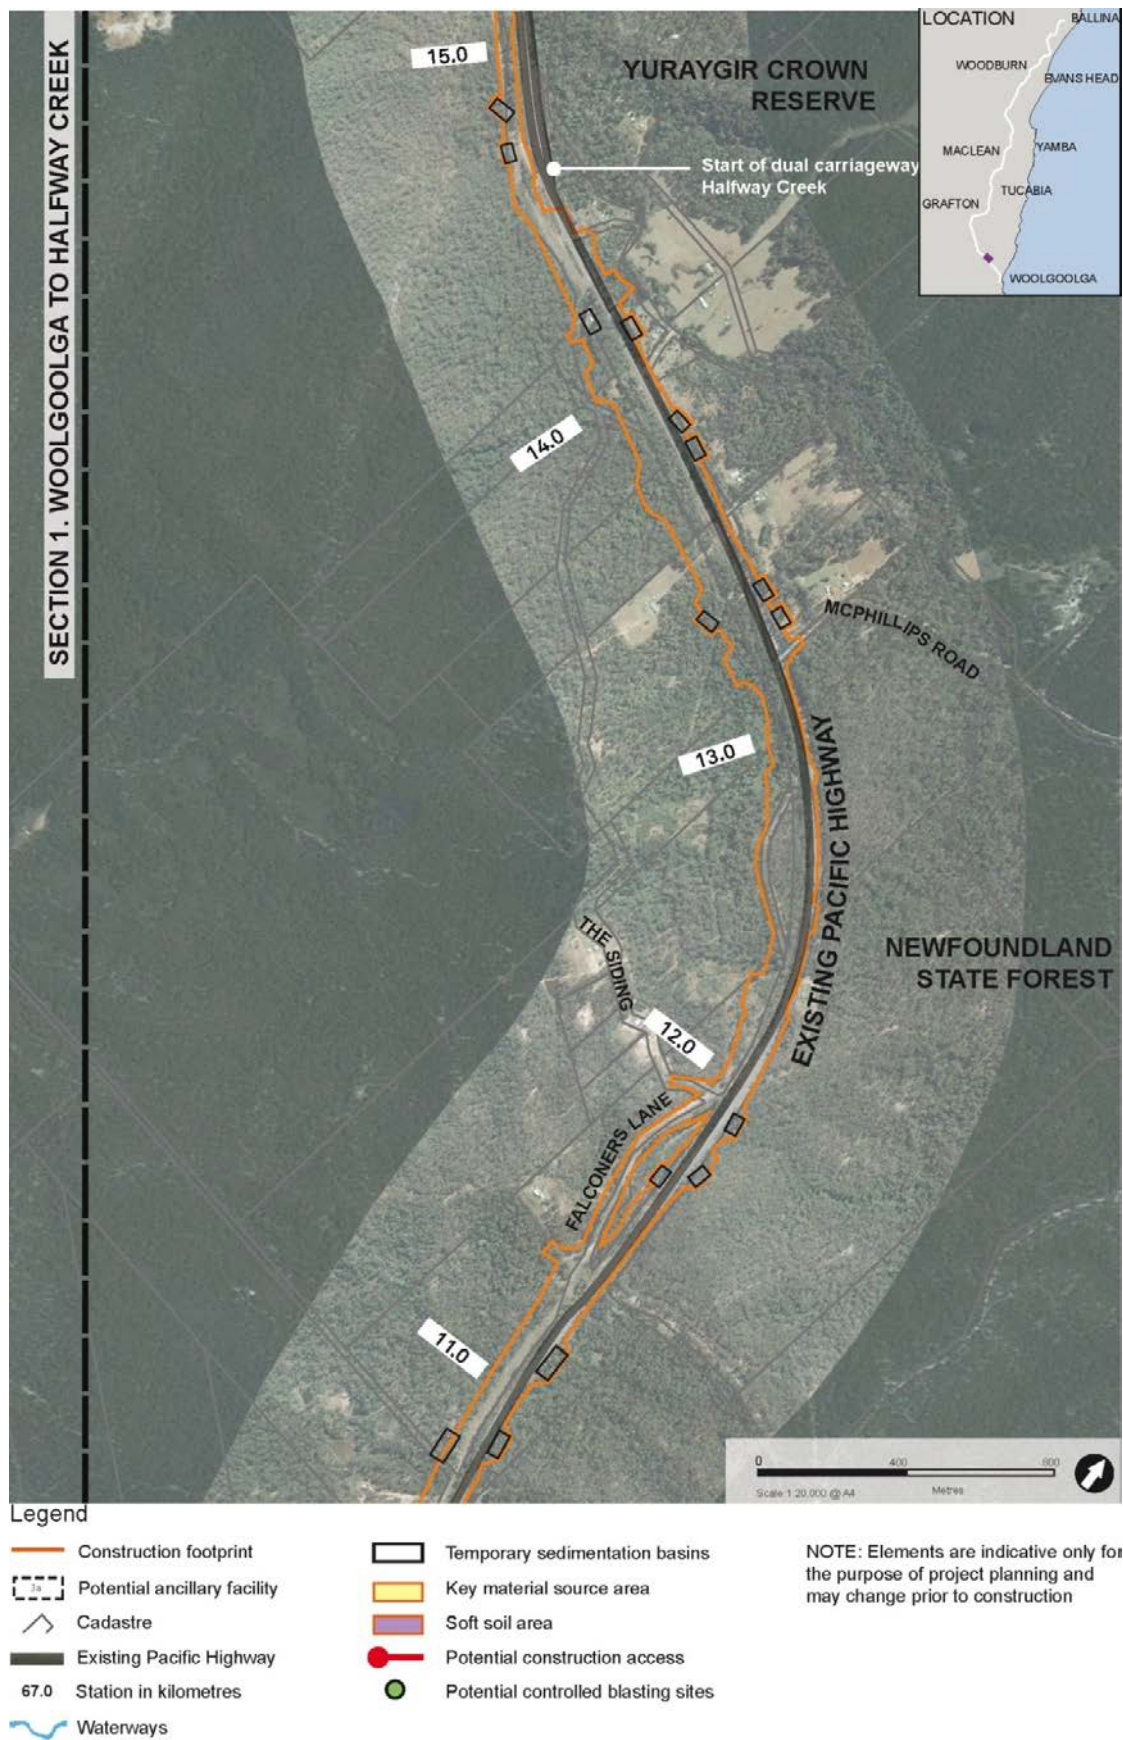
Extent of construction and construction features Section 1 (Station 10.7 to 15.0)
